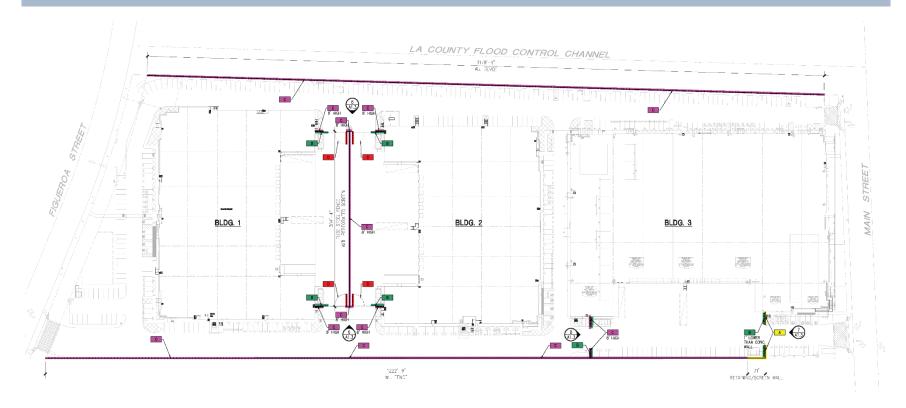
, *Conceptual Wall and Fence Plan*, shows the locations of all proposed walls and fences within the Specific Plan area.
